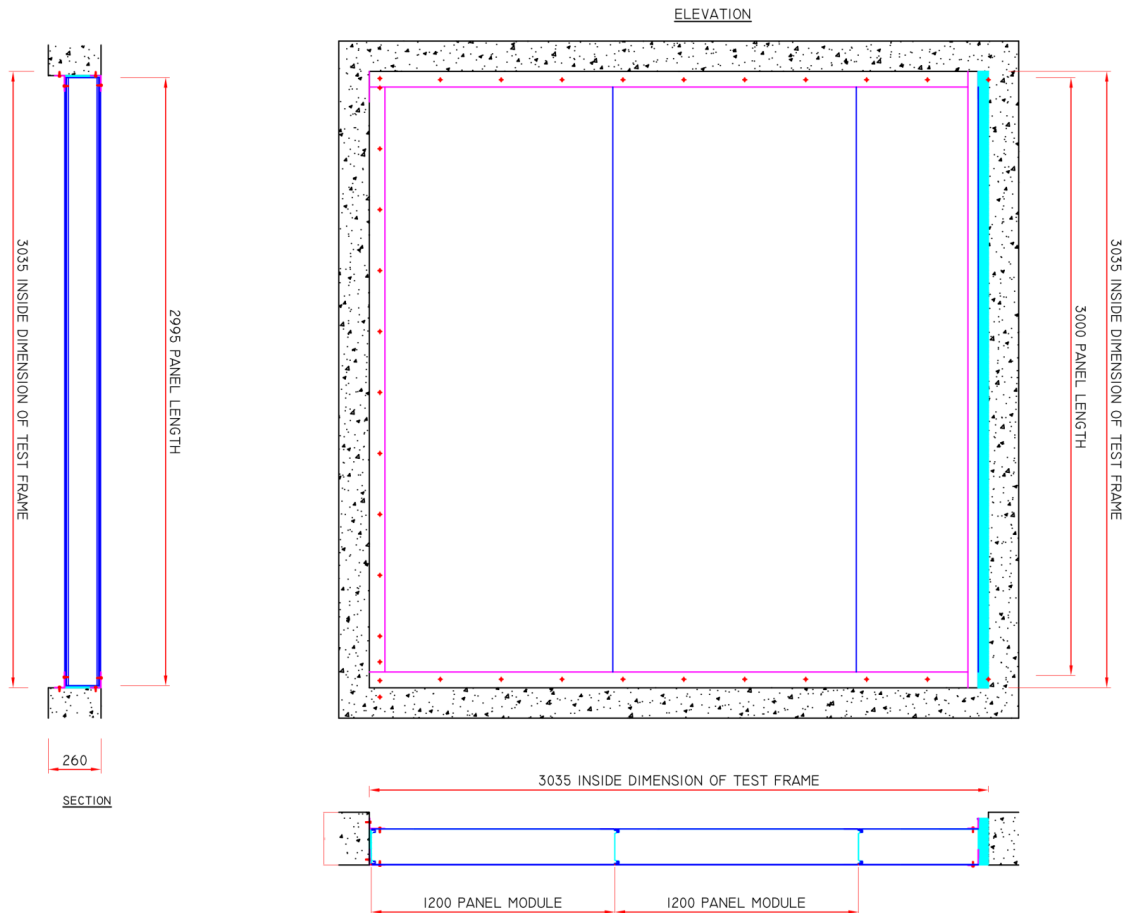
Elevation of the wall sandwich panel specimen (horizontally laid) [9]
